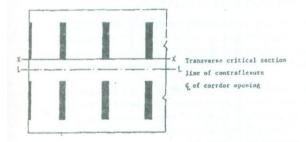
Plan of a typical Shear Wallbuilding showing transverse critical section
